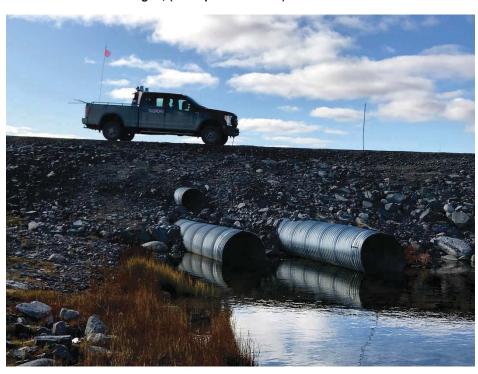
Downstream embankment and road over 3 CSP culverts at KM7.1, looking north (13 September 2018)
